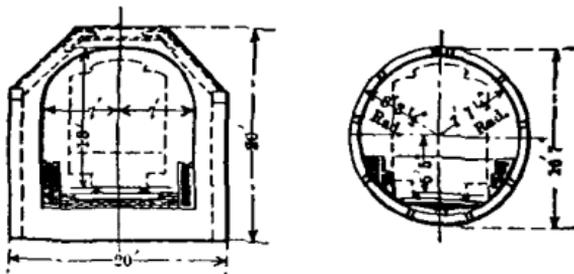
Hudson & Manhattan concrete and iron tunnels.
